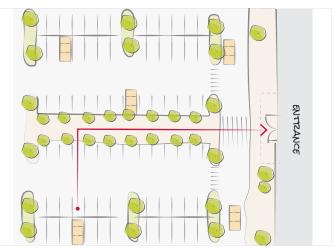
Example of parking modules defined by landscaped islands and pedestrian paths oriented toward building entrances (6.1.2 g).
